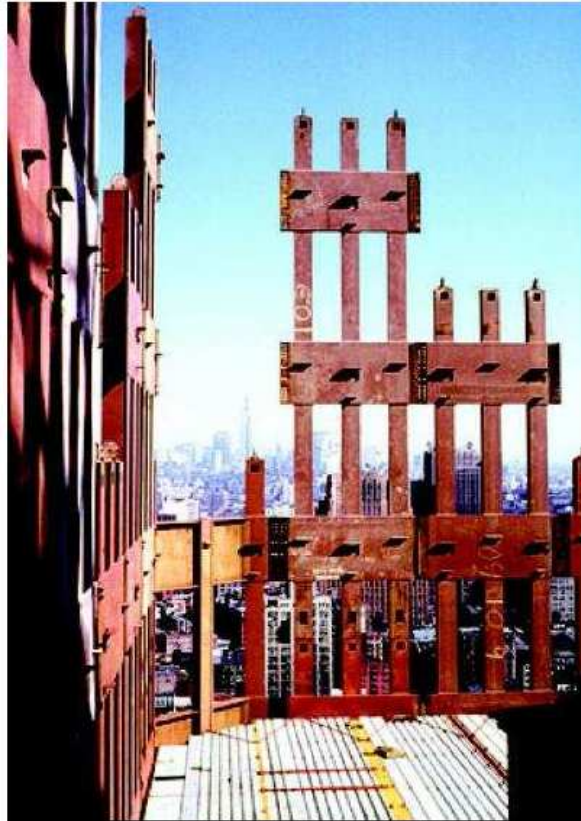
The erection of the prefabricated components, forming the exterior wall and floor deck units. FEMA report 2000
